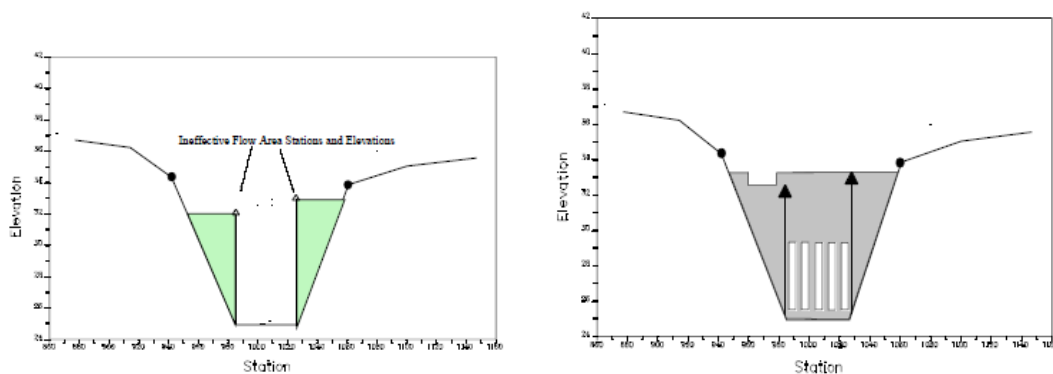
Cross Section Layout for Inline Gated Spillways and Weirs
